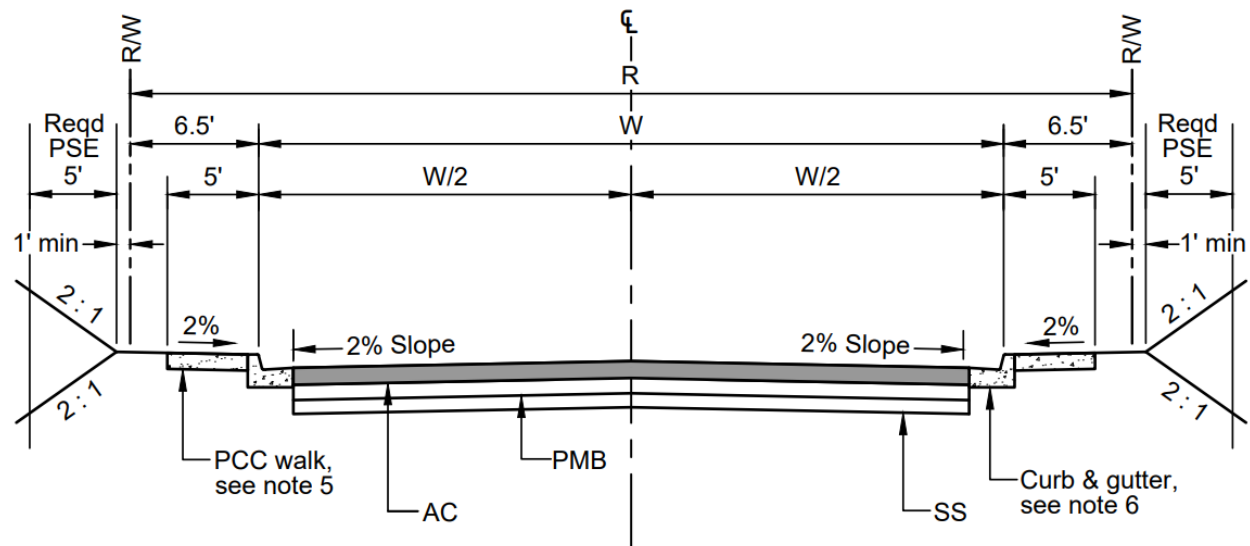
Plate B-5 cross section. R – Right of way width; W - Pavement width; F- Flooding free width.
